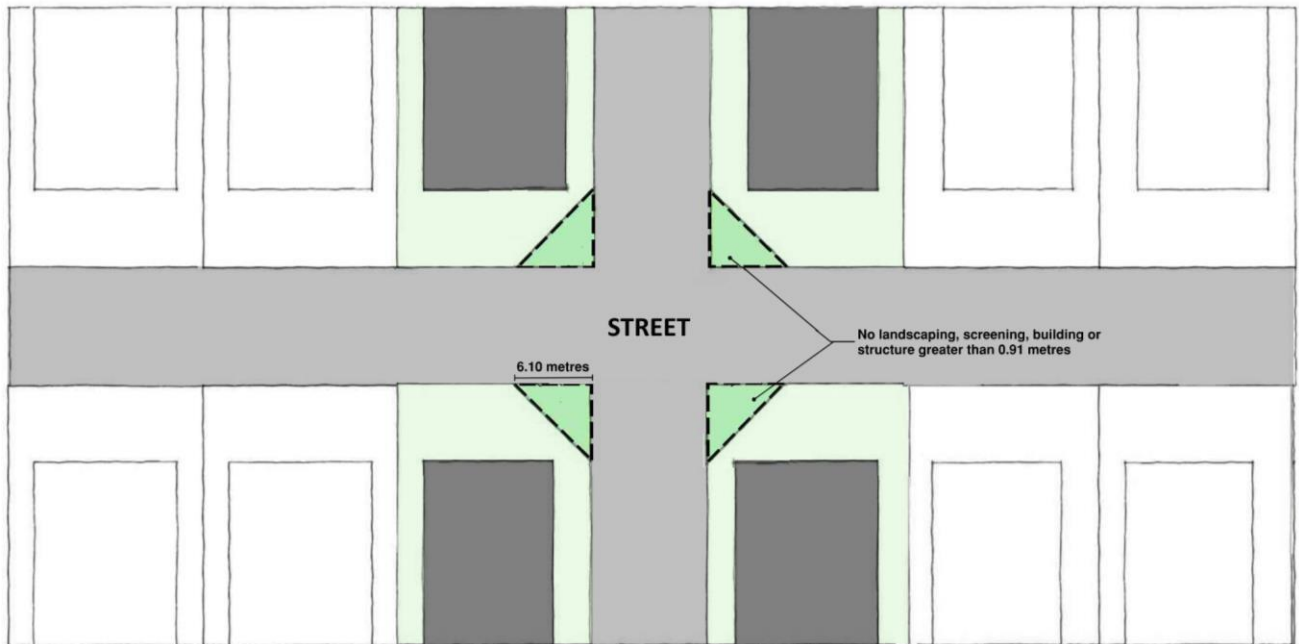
Visibility at Intersections, Area that landscaping, screening, building, or structures are prohibited over 0.91 metres in height
